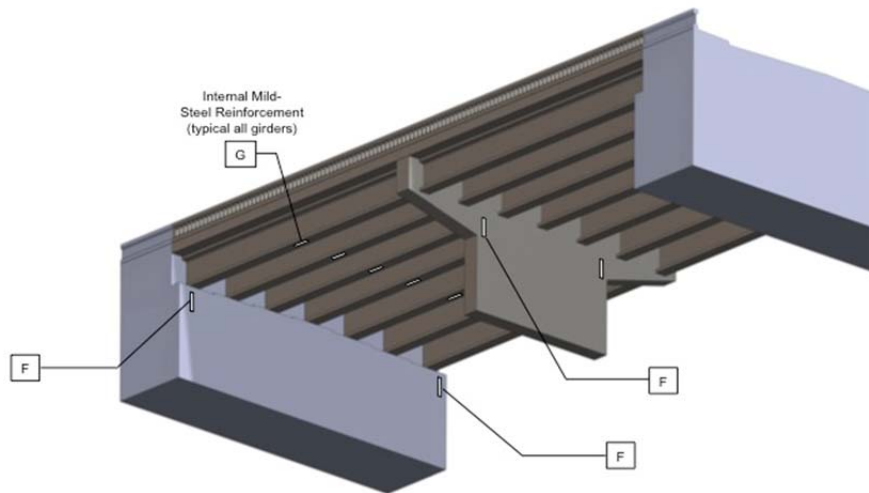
Precast concrete bridge instrument layout bottom isometric
